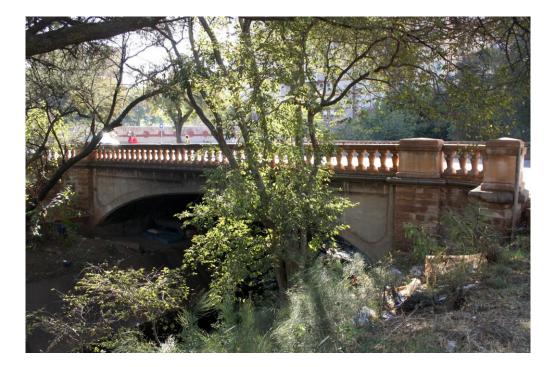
Victoria Bridge built in concrete as it is today (Source: ABLEWiki, 2009)
